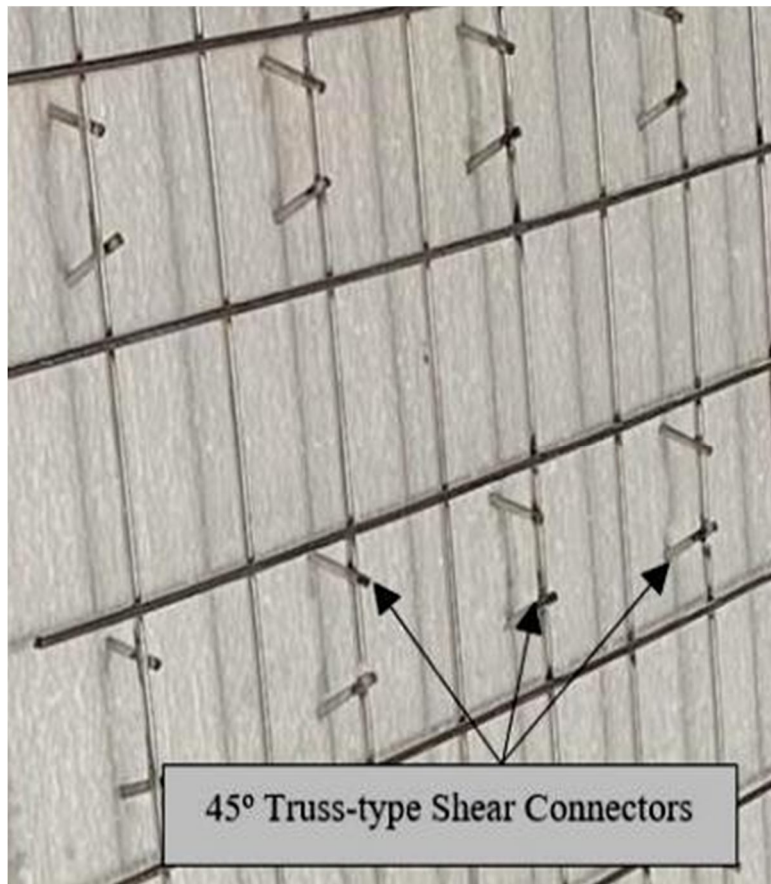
Truss-type shear connectors and wire mesh reinforcement used in CSP fabrication: Ø 2.5 mm HT steel wire, welded at junctions, at 45° inclination through EPS core [3].
